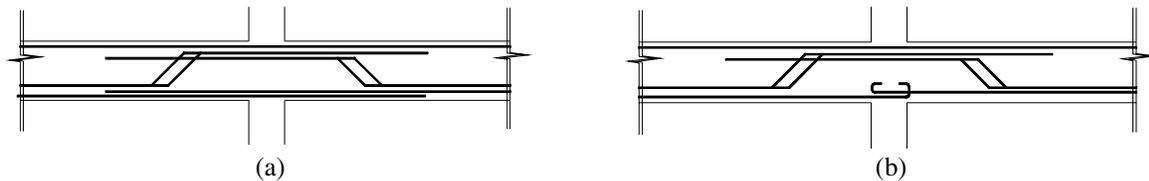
Beam Detailing for (a) Perimeter Frames and (b) Interior Frames
